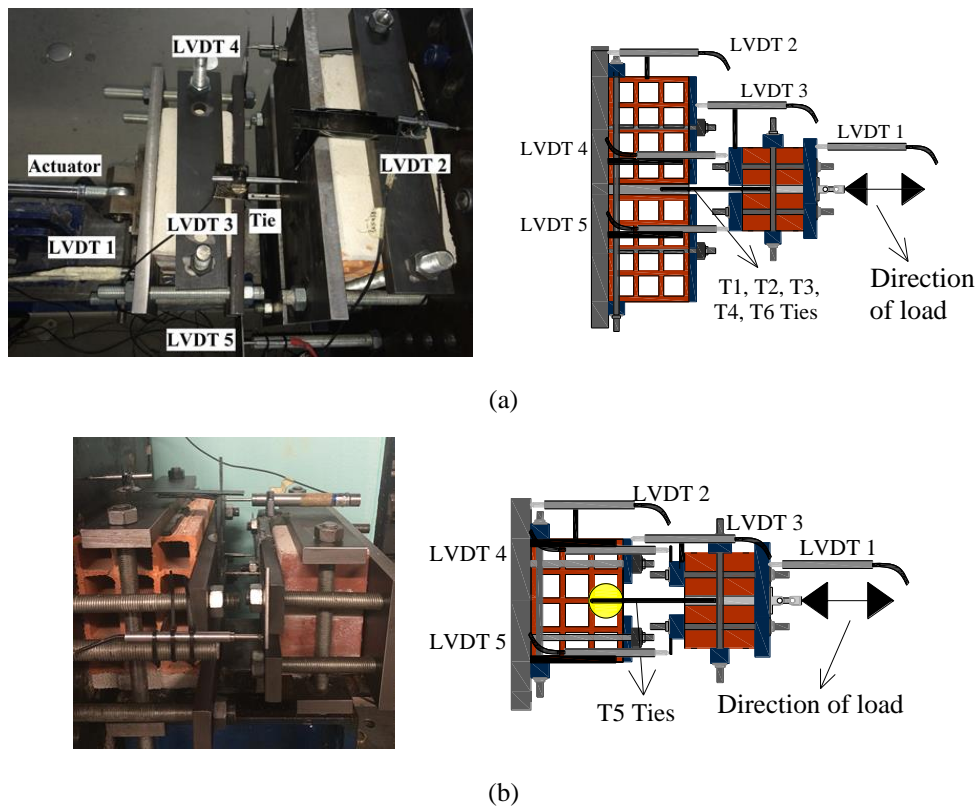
Tension-compression test setup details: (a) distribution of LVDTs on specimens with T1, T2, T3, T4 and T6 typologies and (b) distribution of LVDT on specimens with T5 wall tie
